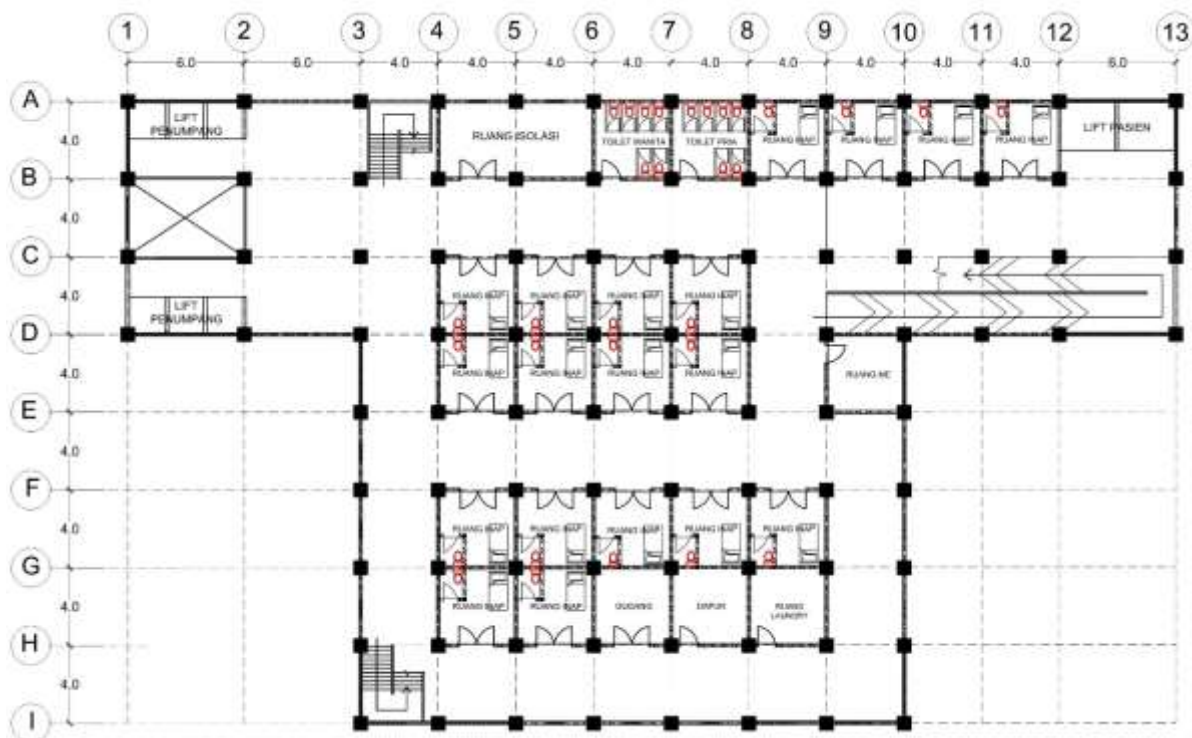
Floor Plans for Floors 4 to 10 (Typical)
